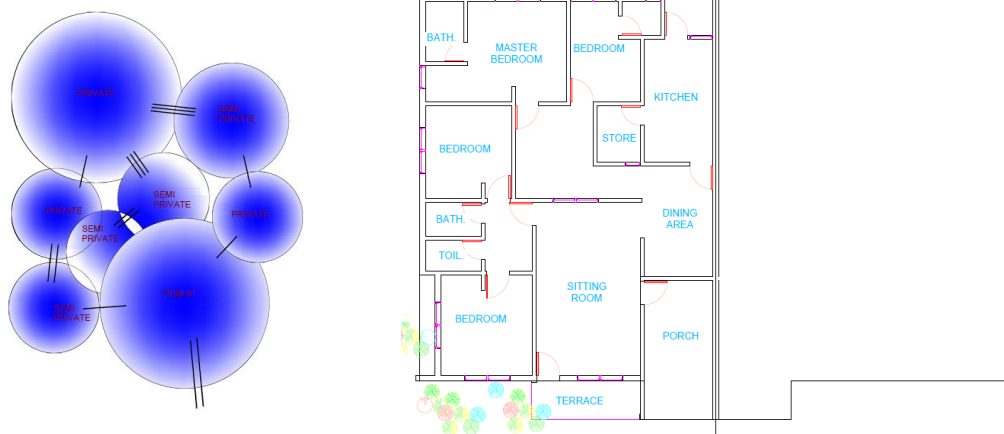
Building Zoning; Figure 4: Building Floor Plan
